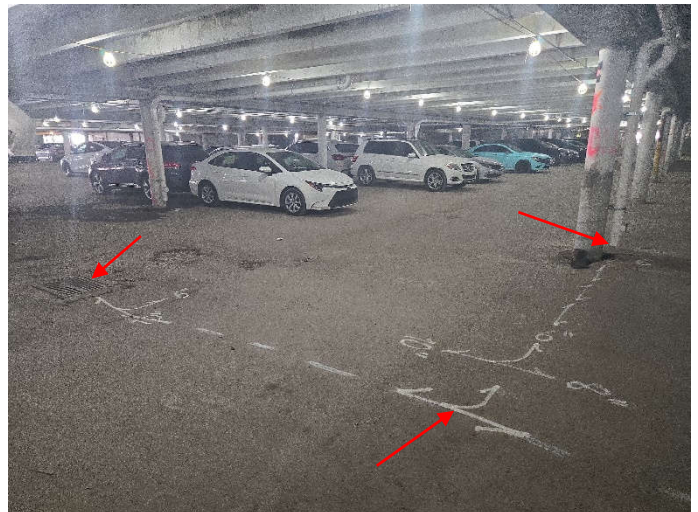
Plaza del Prado, Garage Deck Storm Drainage, Downspout D11 and existing Catch Basin. Proposed underground layout.
